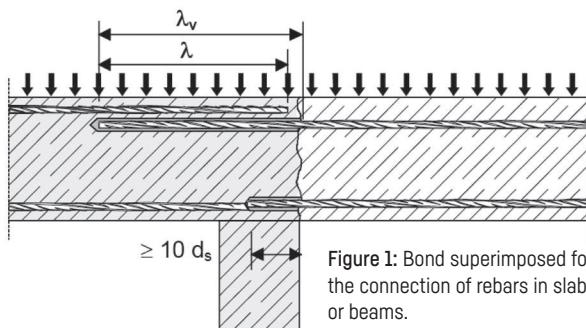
Bond superimposed for the connection of rebars in slabs or beams.
